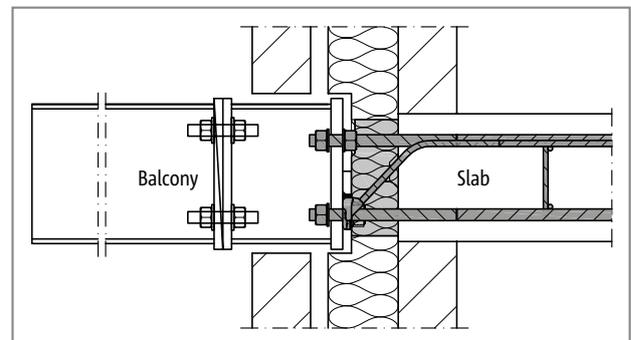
Schöck Isokorb® T type SK: Insulating element within the core insulation; on-site adapter between the Isokorb® and the balcony to enable flexible installation
